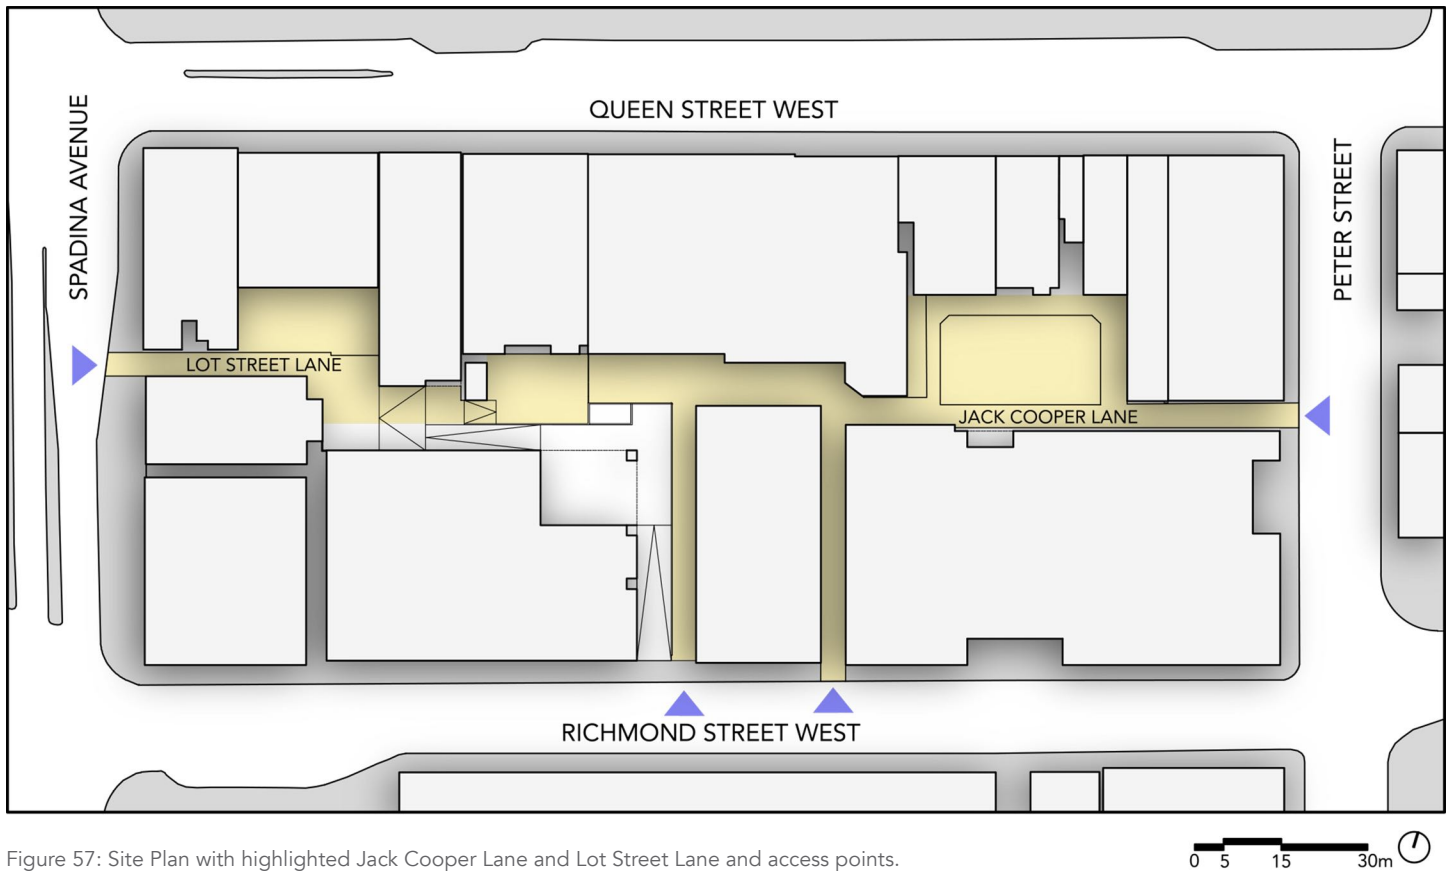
Site Plan with highlighted Jack Cooper Lane and Lot Street Lane and access points.
